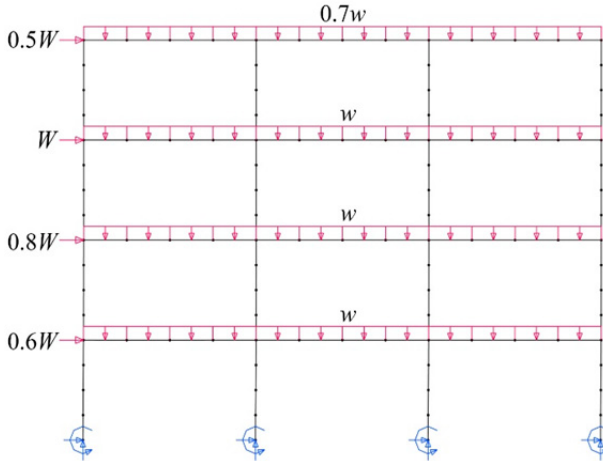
MASTAN2 model of steel frame with specified wind loads and floor loads.
